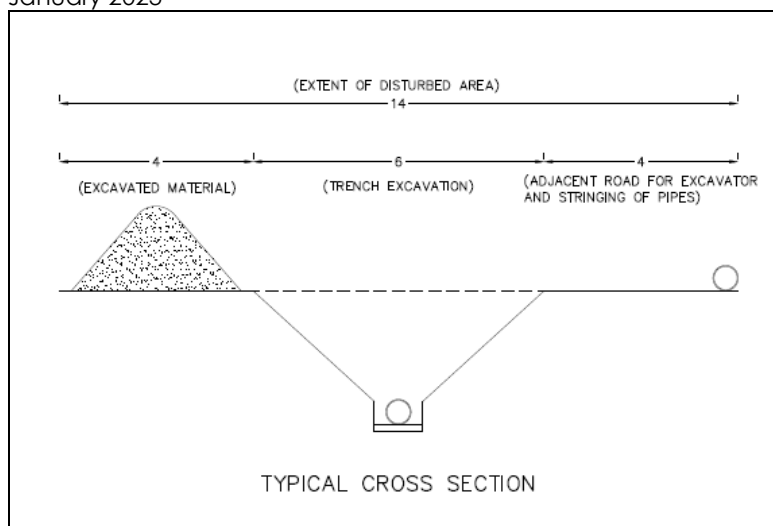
Typical cross section showing the proposed development footprint for the installation of a pipeline.
